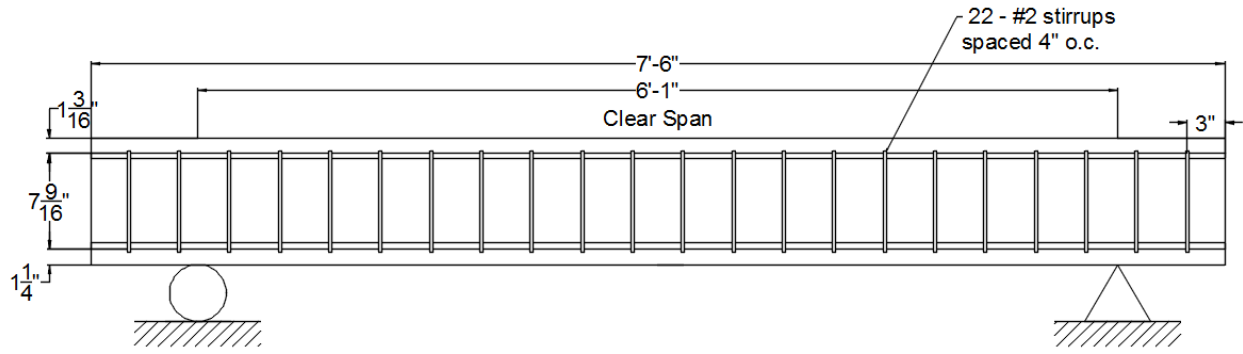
Image. Longitudinal section of reinforced concrete test specimen.
